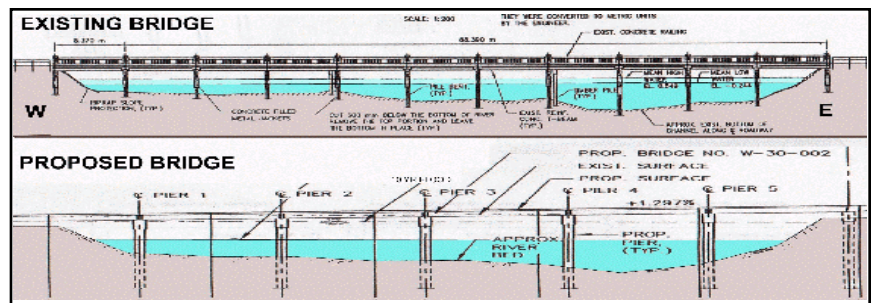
Diagram of existing bridge, and proposed bridge design (from MHD permit application). The new bridge will have fewer, but larger, support columns, and its elevation will be increased, especially at the eastern end. The depths in the lower diagram are approximate, and fill removal under the bridge is not proposed, except old column removal.
